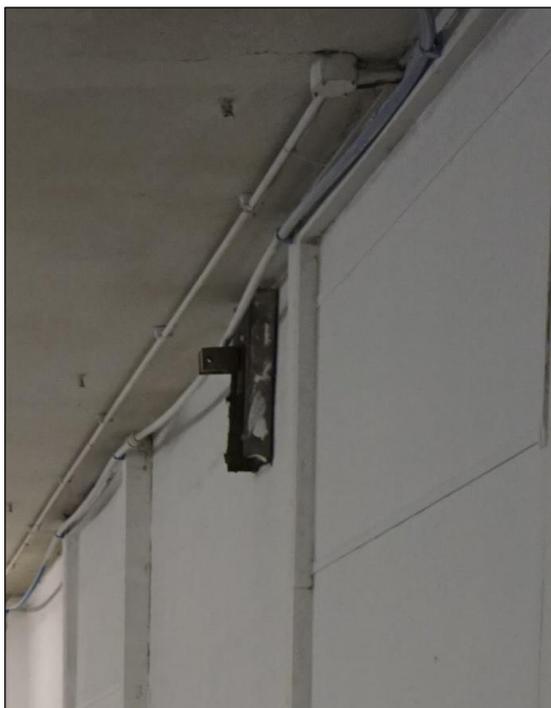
U-shaped channel on the western face of the cross-wall, facing north
